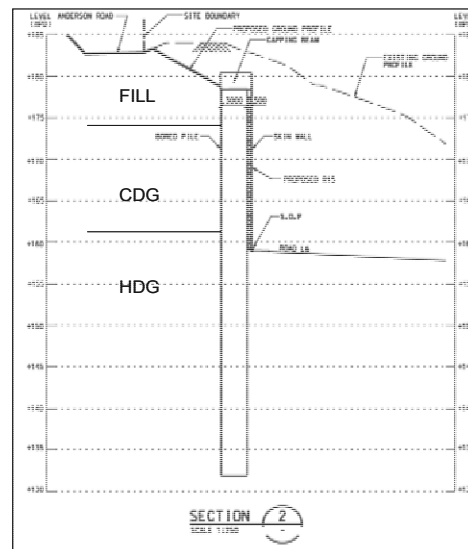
Cross section of bored pile wall in Hong Kong (after Ho et al. 2013).
